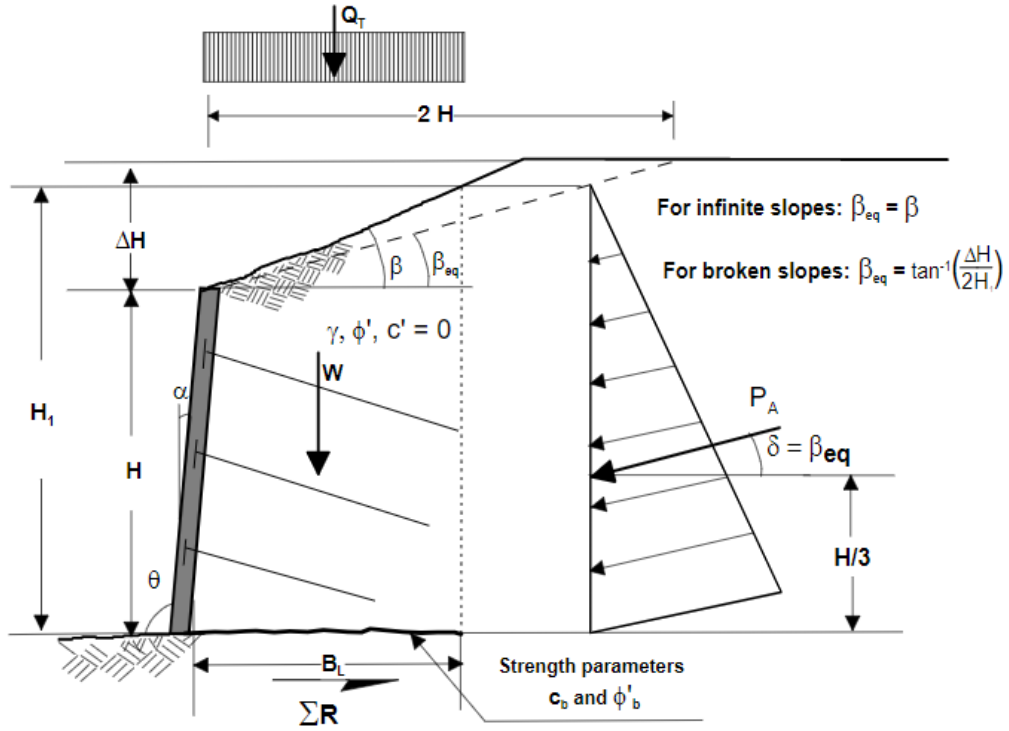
Soil nail wall sliding stability (Lazarte et al. 2003)
